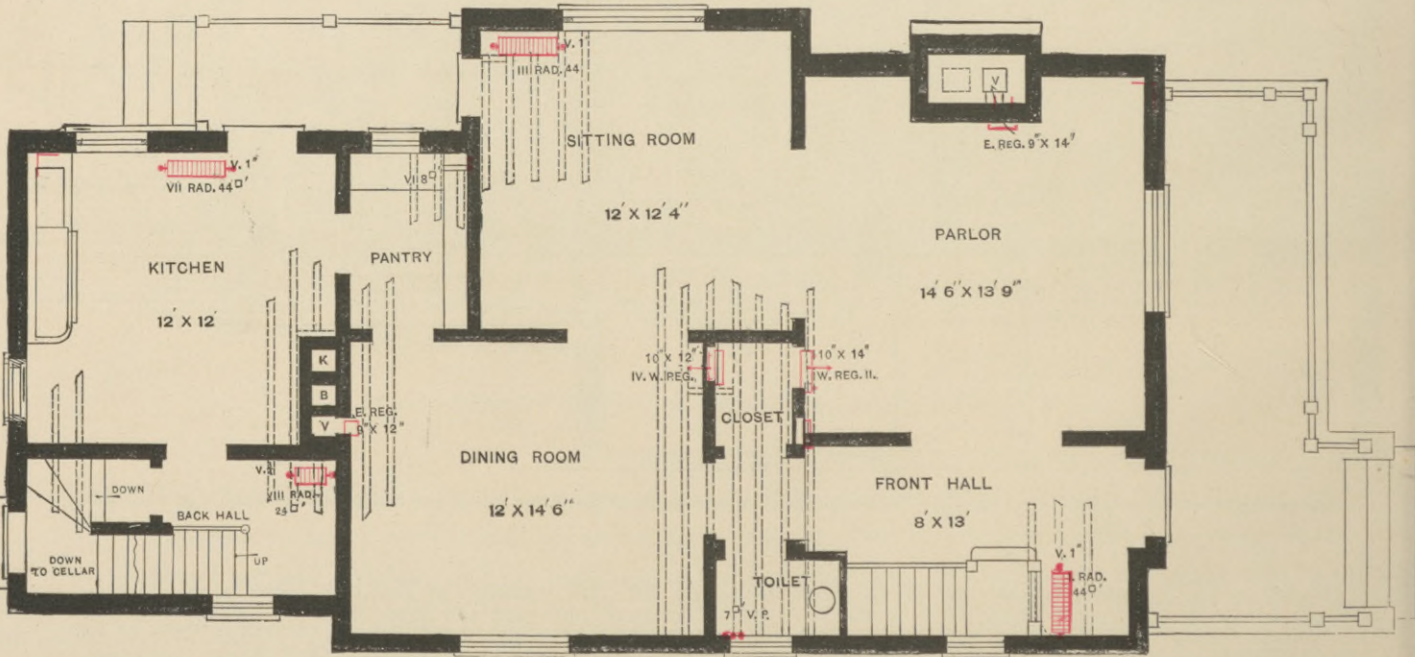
Plan of First Floor. Scale 1/8 inch to the foot.
